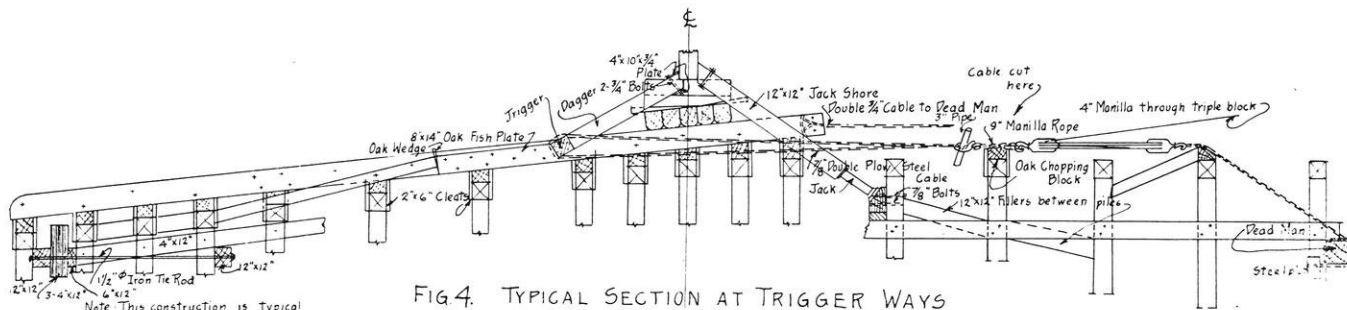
TYPICAL SECTION AT TRIGGER WAYS
